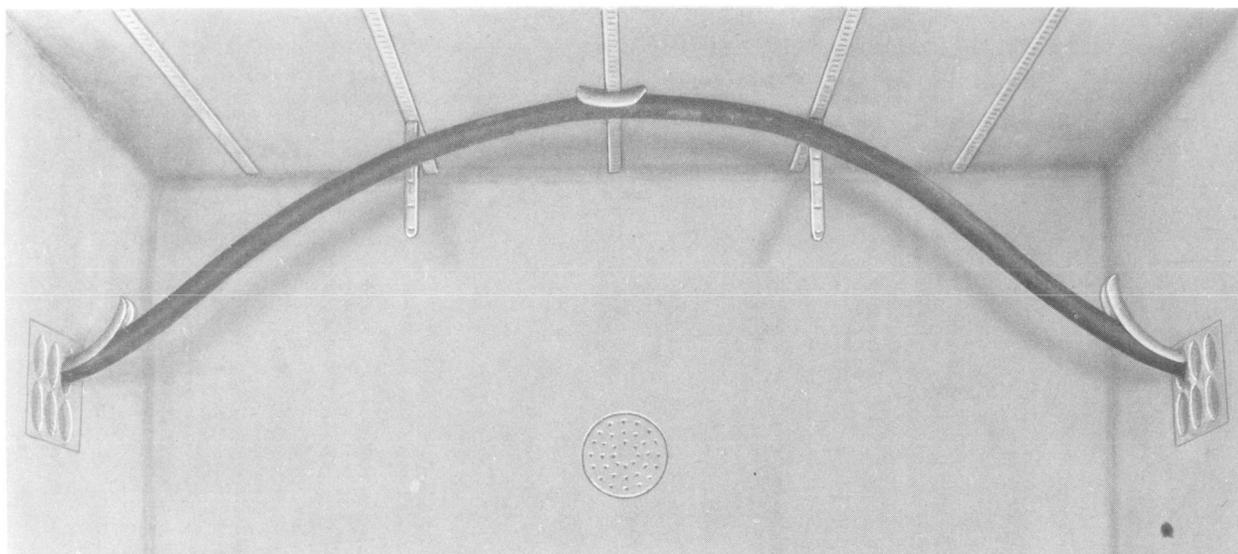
Position of Cable After Use of B Cable Racking Jacks
